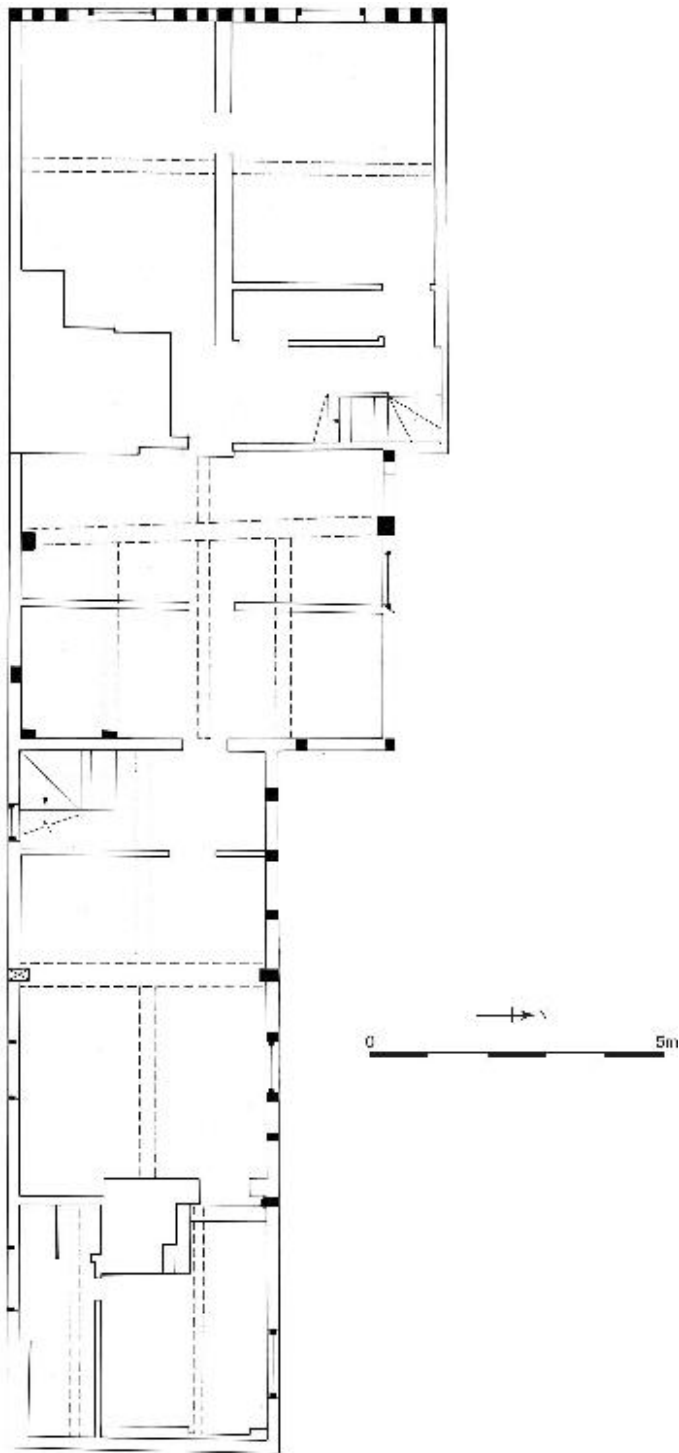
The ground-floor plan of 14 Church Street, clearly showing its three component buildings; the street is to the top of the plan (north to right)
